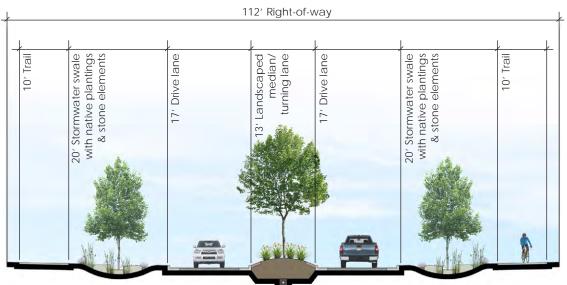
Typical rural section of what Grandview Avenue could look like with stormwater swales, native plantings, a landscaped median, and recreation trails.
